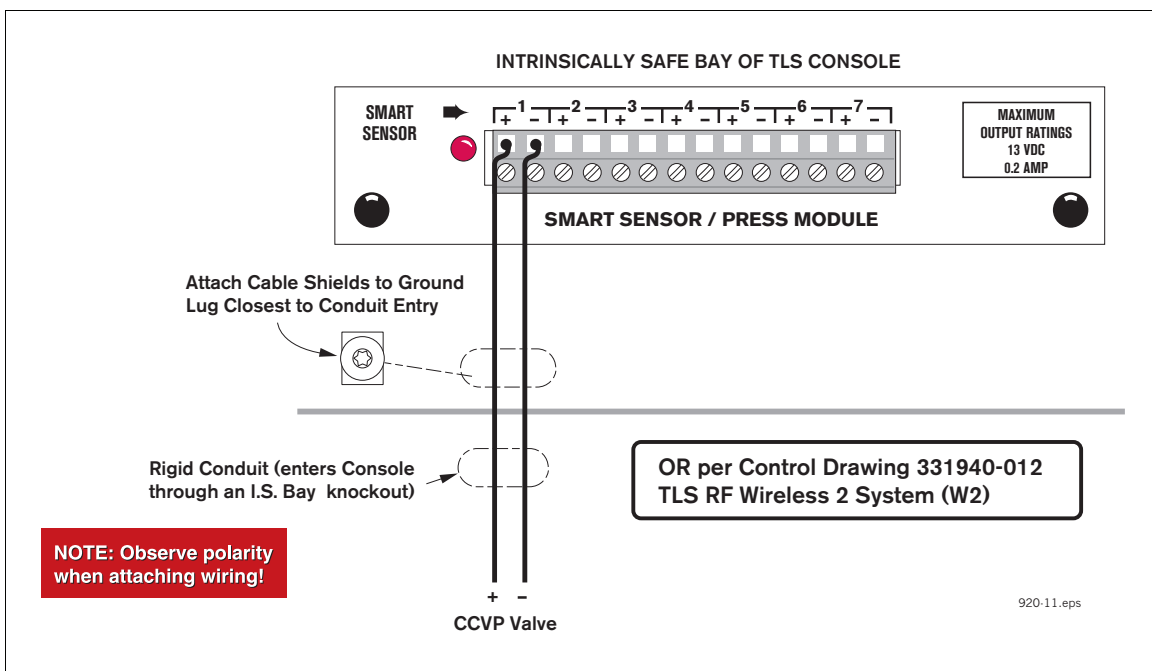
Attaching CCVP vapor valve wiring to TLS-350 console - direct-wired CCVP only
